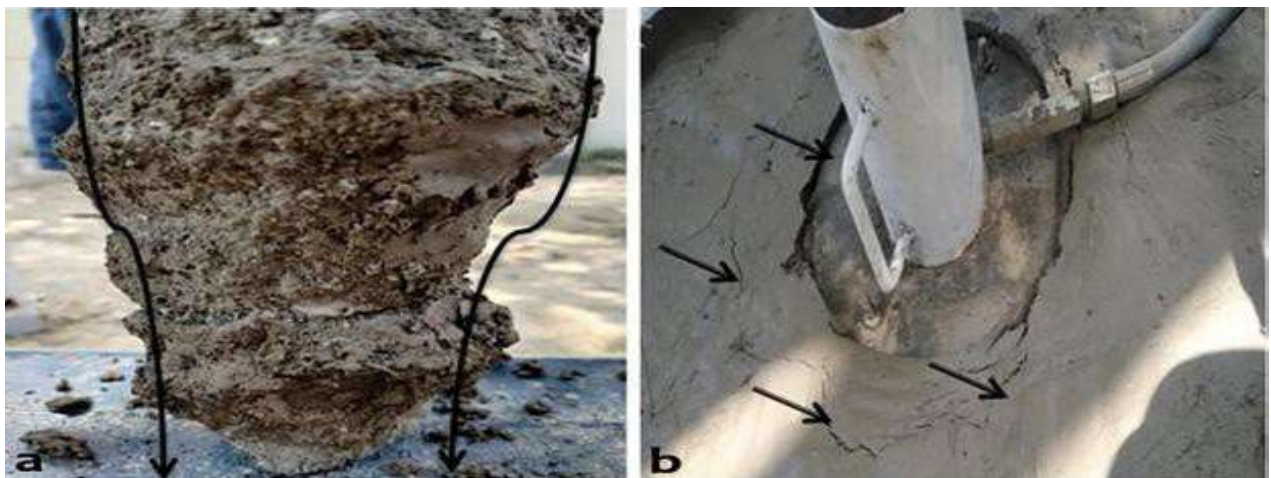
(a) Exhumed single column showed bulging failure; (b) failure cracks developed on the bed.
